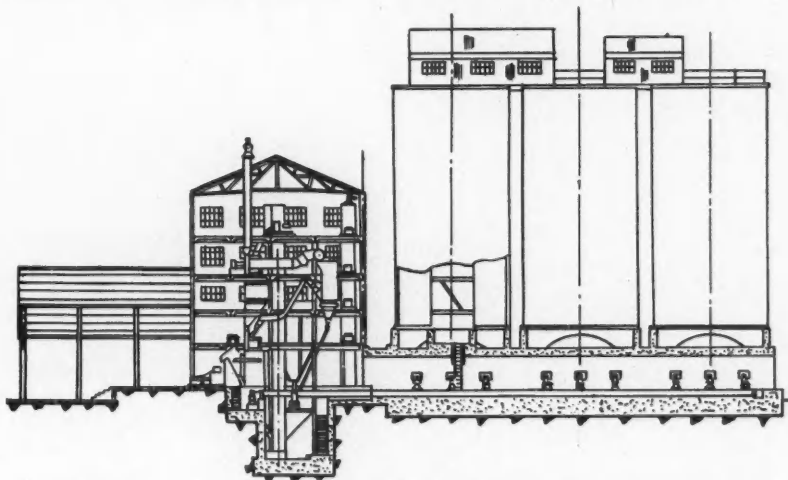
Section showing arrangement of Packing Plant and Cement Silos.
